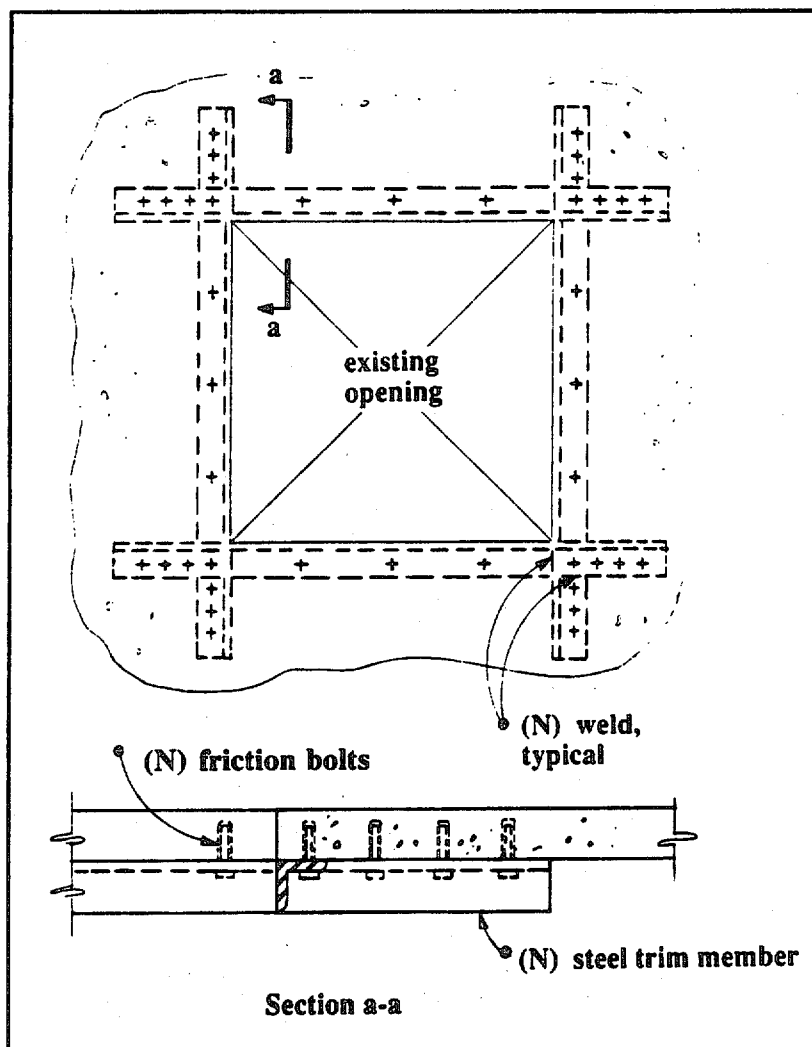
Reinforcement of an opening in an existing concrete diaphragm.
